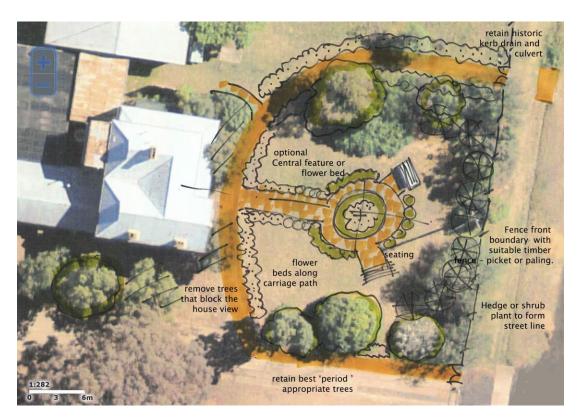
landscape Concept plan. B Hickson 8 Feb 2021
